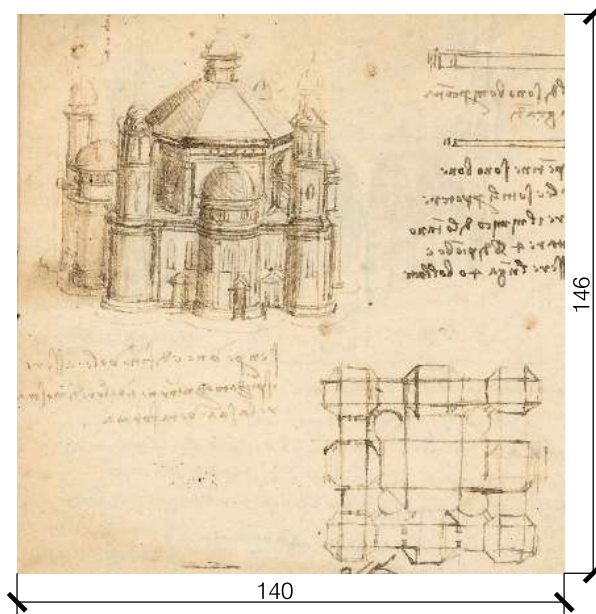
Ms. B, f. 39v: drawing of the church with its dimensions in mm.
